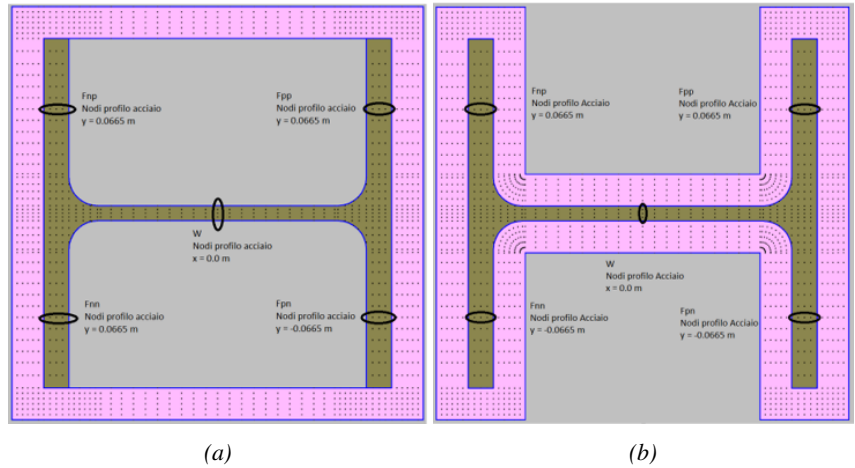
Sections: a) Columns #B and #C; b) Column #D.
